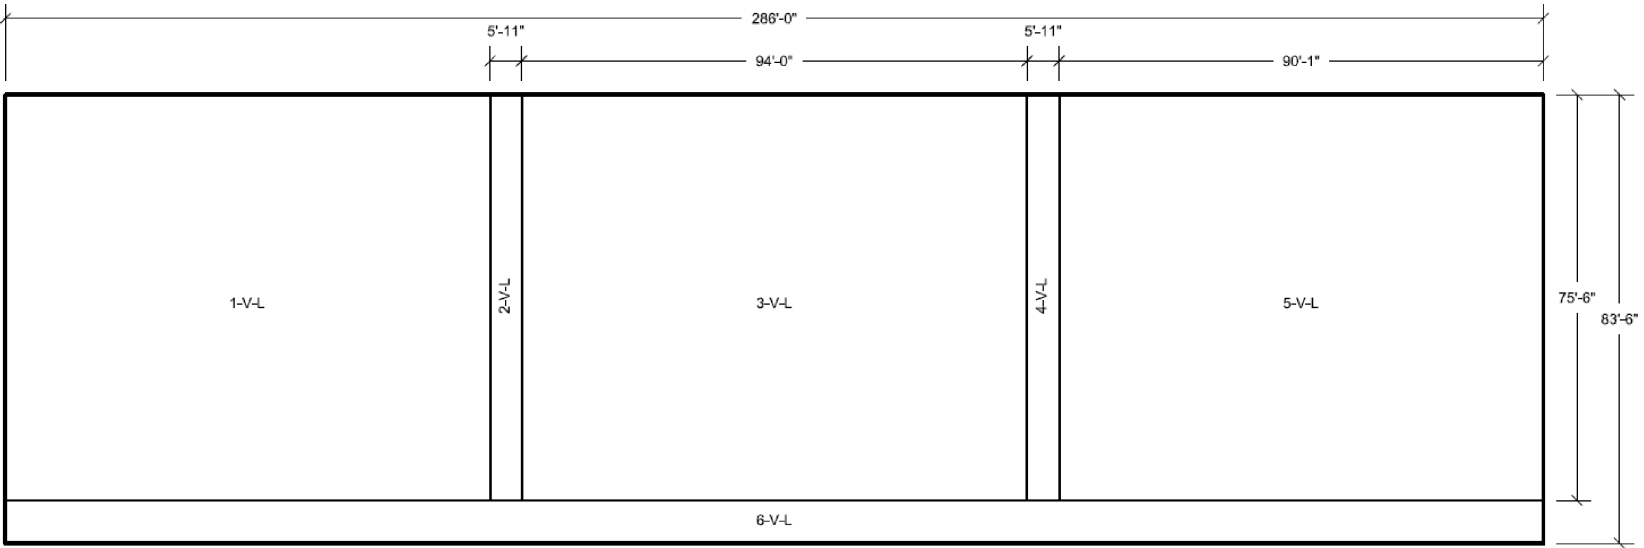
H.6-90 UHS Basin South Wall Looking North Vertical Reinforcement Zones Far Side Face
